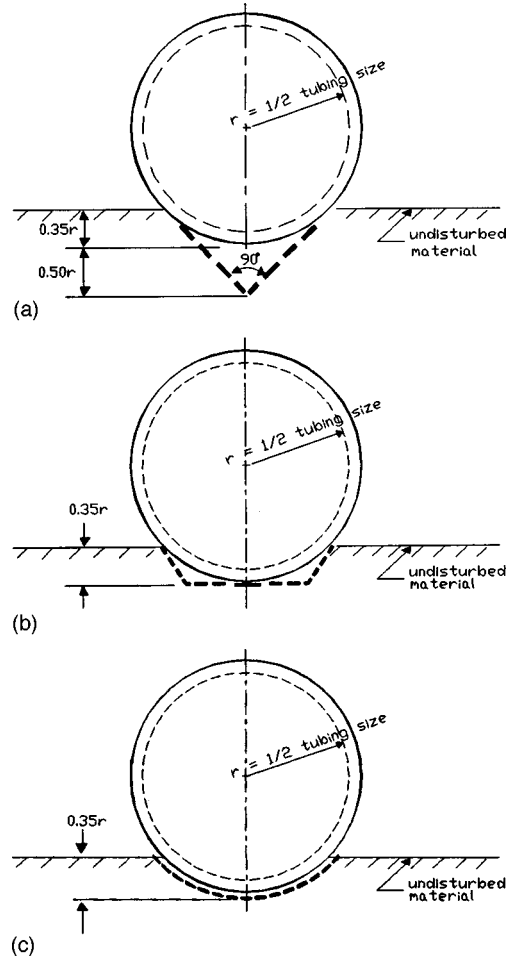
(a) Formed trench bottom dimension for a 90° V groove. (b) Formed trench bottom dimension for a trapezoidal groove; note that trapezoid side slopes are tangent to the corrugated plastic tubing perimeter. (c) Formed trench bottom dimensions for circular shaped bedding cross section
